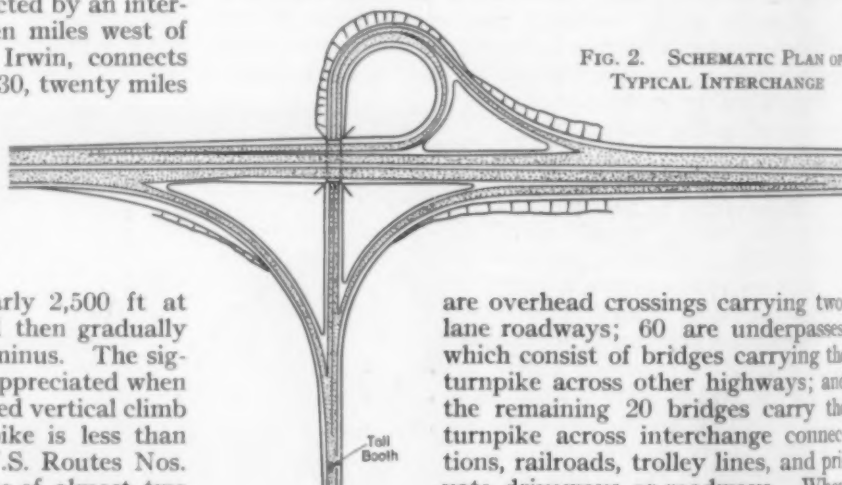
SCHEMATIC PLAN OF TYPICAL INTERCHANGE
